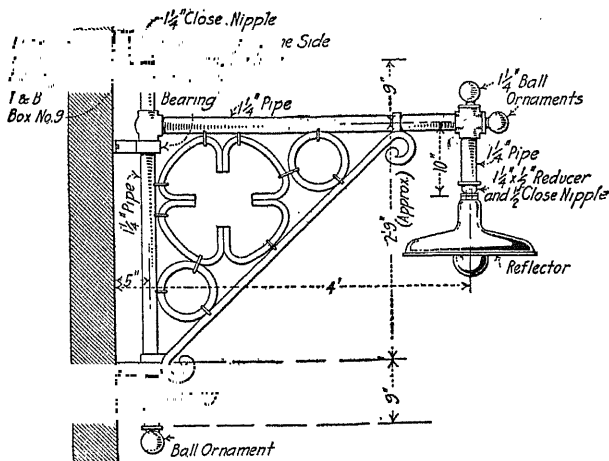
Large Bracket Fixture for Wall Mounting Arranged to Permit Turning Out of Way of Crane
